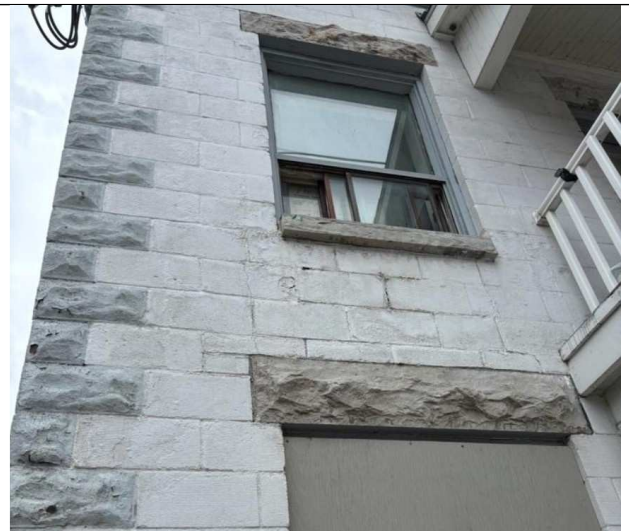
Weathering, vertical cracking and step cracking in cladding.
